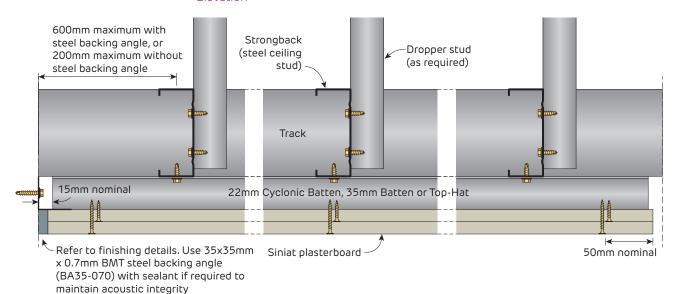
Stud Ceiling Type A3 - Fixed / Sliding Flevation
